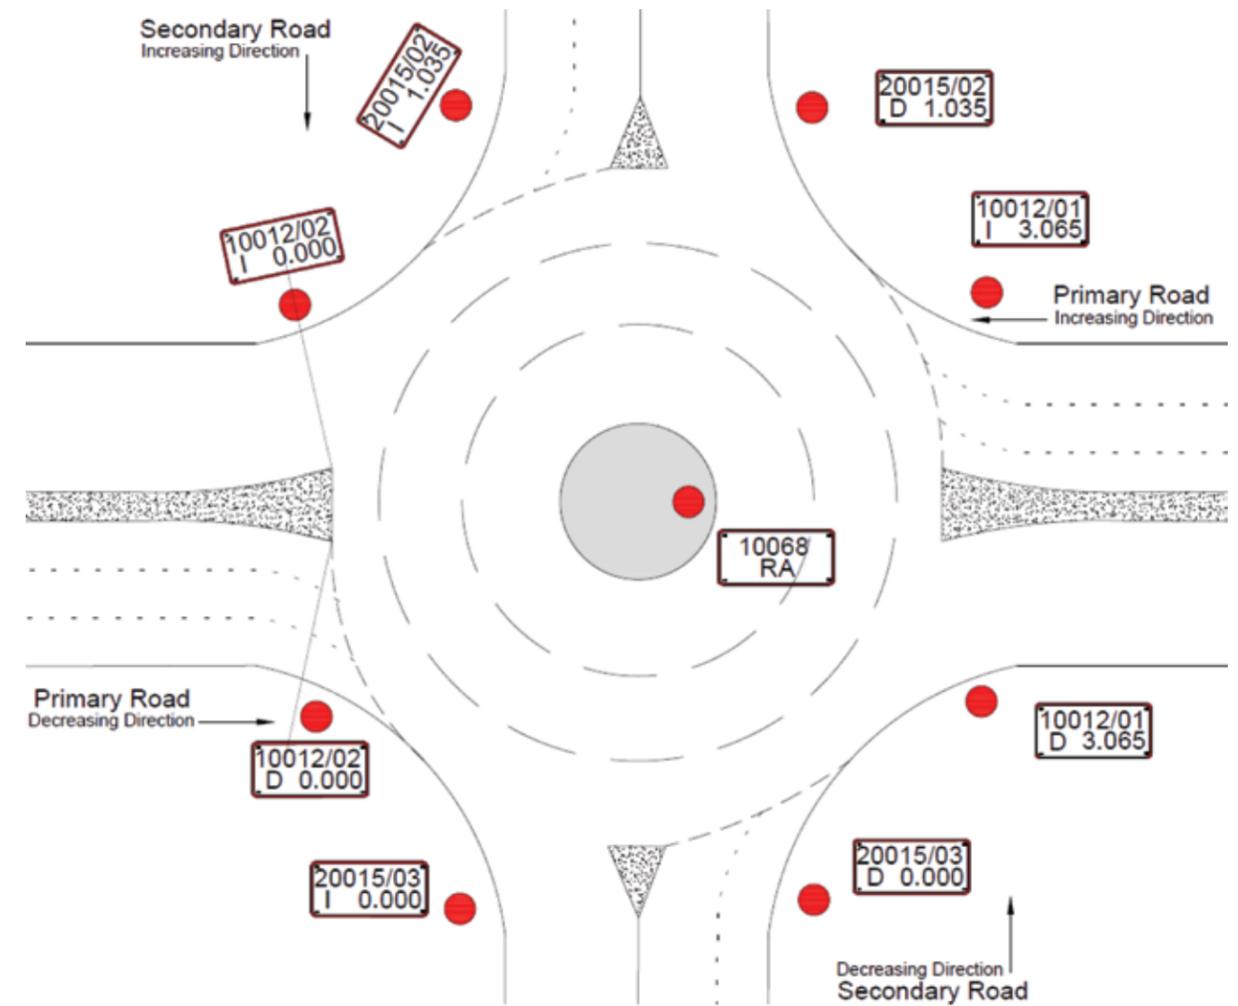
Typical NRS Sign Layout at an Un-signalised Intersection
